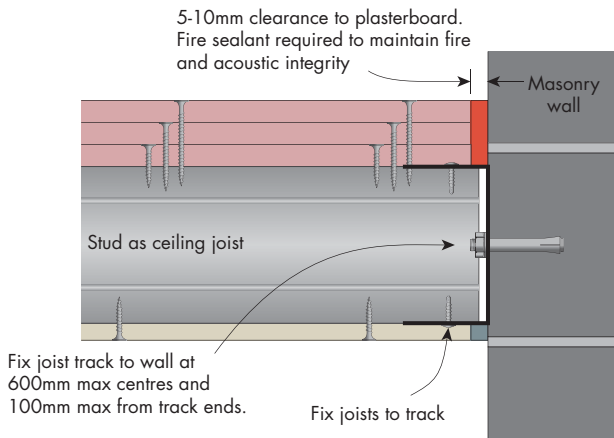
Fire Escape Tunnel Ceiling to Masonry Wall
